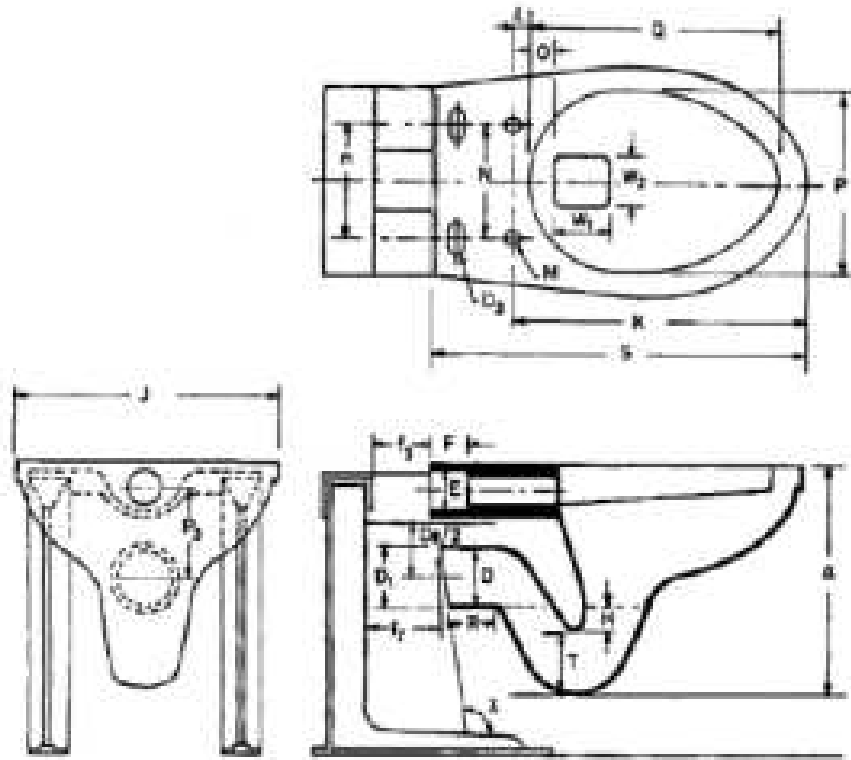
Typical illustration of Water Closet with Fixing Arrangement on top of Bracket (Pattern 2)
